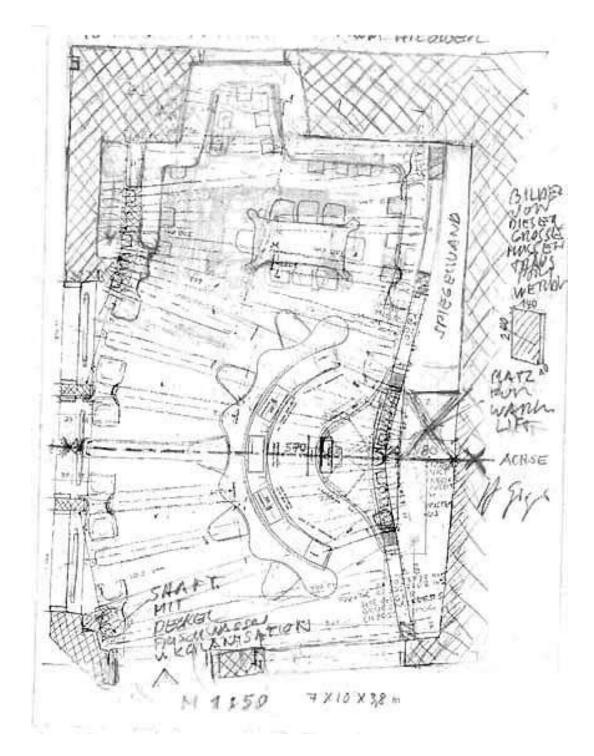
Floor Plan - Gruyeres Bar, by H. R. Giger, 2003. This early floor plan shows Giger's plan for his Gruyere bar including chair and bar placement and initial dimensions.
